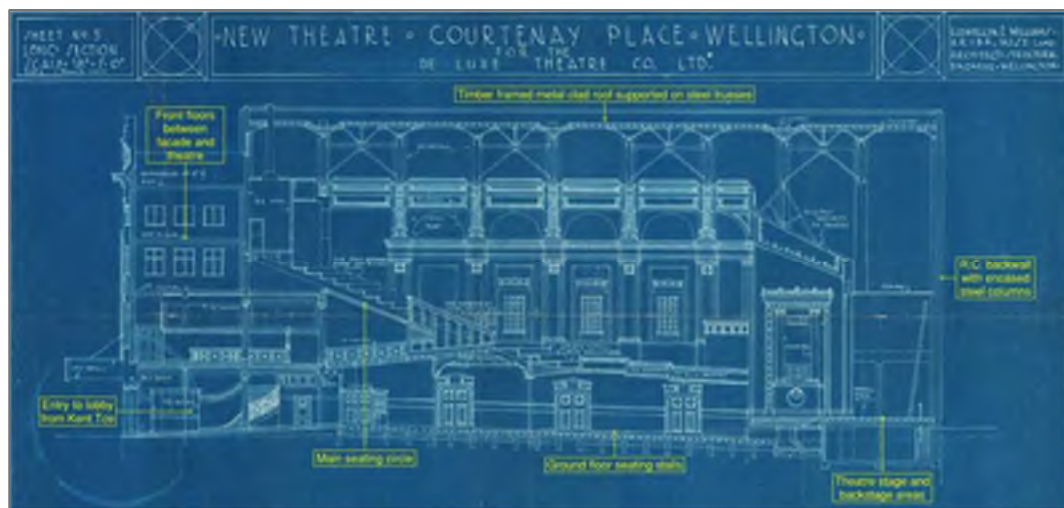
Longitudinal section from original blueprints (1923) showing building with single theatre with two seating tiers and front lobby with facade.
